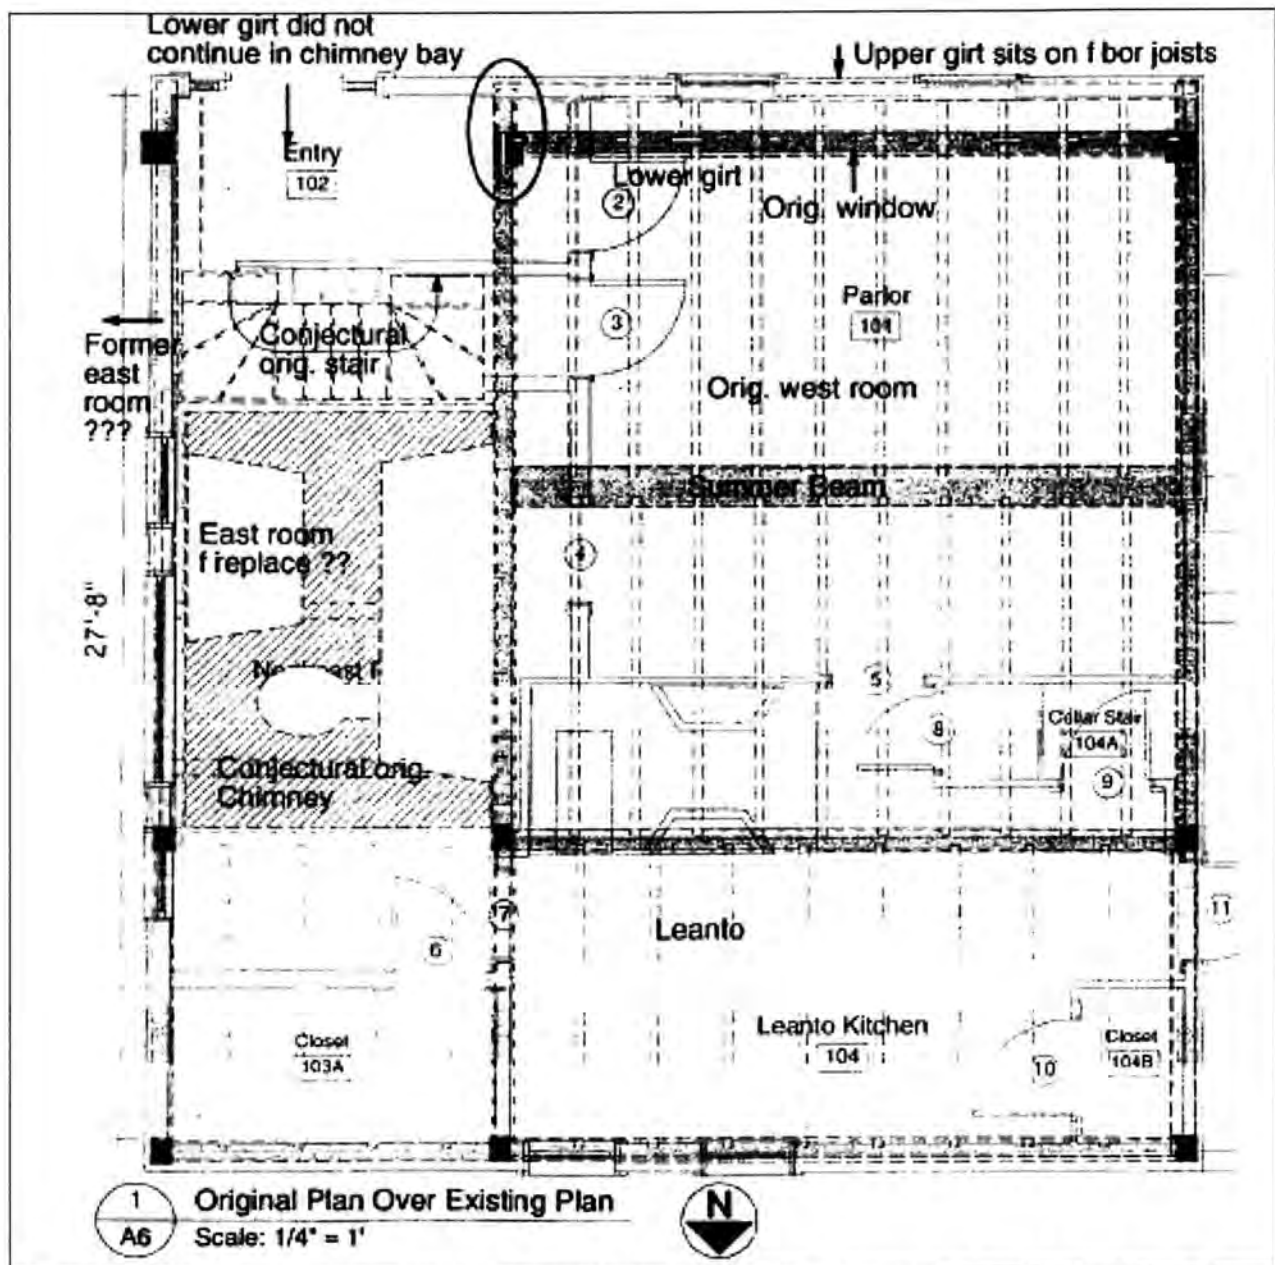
Plan of original house superimposed over existing first floor plan. Drawing by Finch & Rose, 2007.
